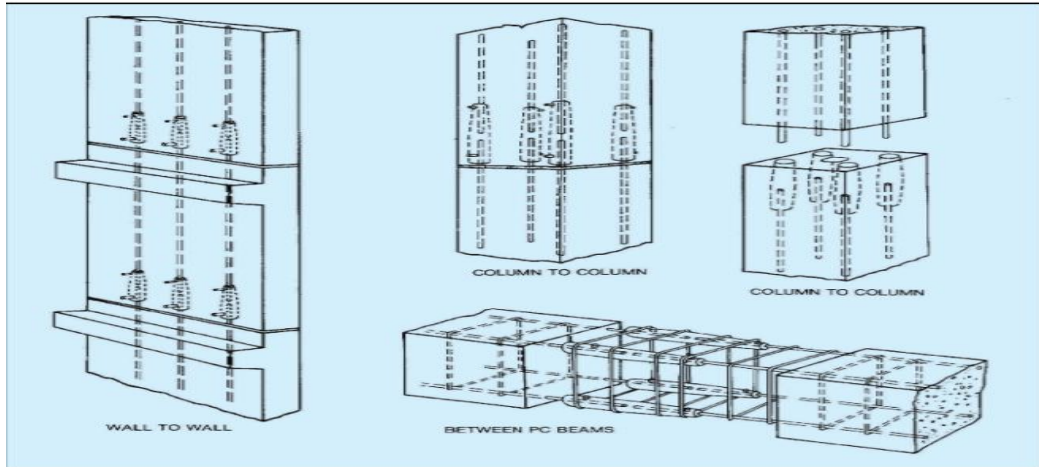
it shows the arrangement of in different precast concrete connection (Yee, 2001)
